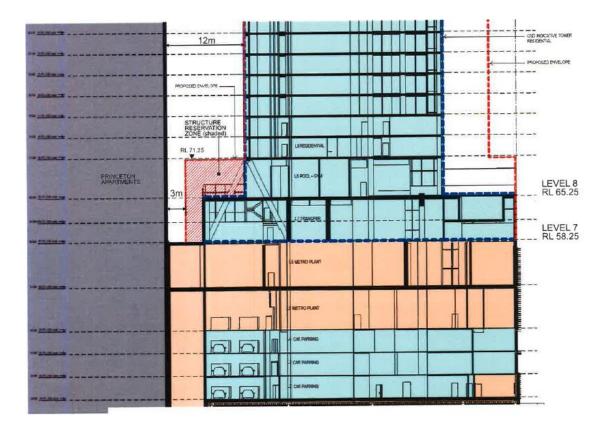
Pitt Street South concept SSD DA - Building section [Source: SSD 8876 Concept Stamped Plans]
